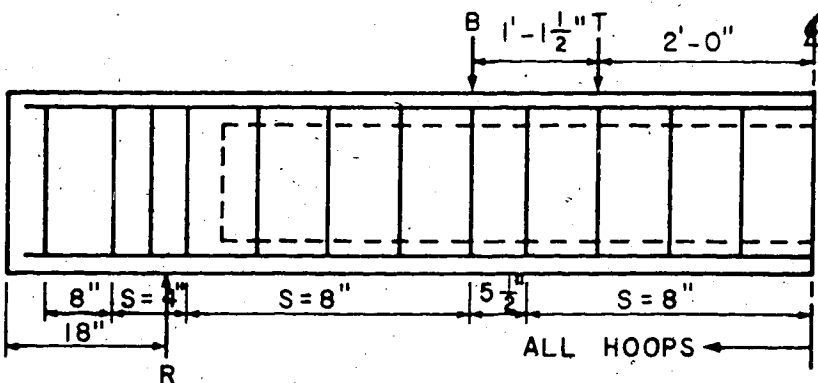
(C) REINFORCEMENT FOR BEAMS T1 AND T2
